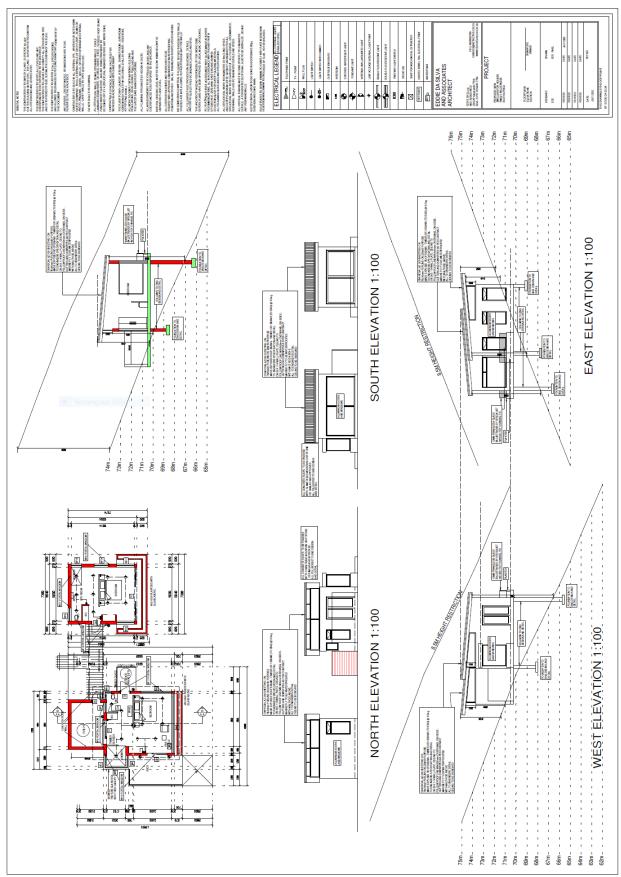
Tourism Pods – Floor Plan, Elevations Section, Courtesy of Eddie Da Silva and Associates Architect. Please see Annexure C.
